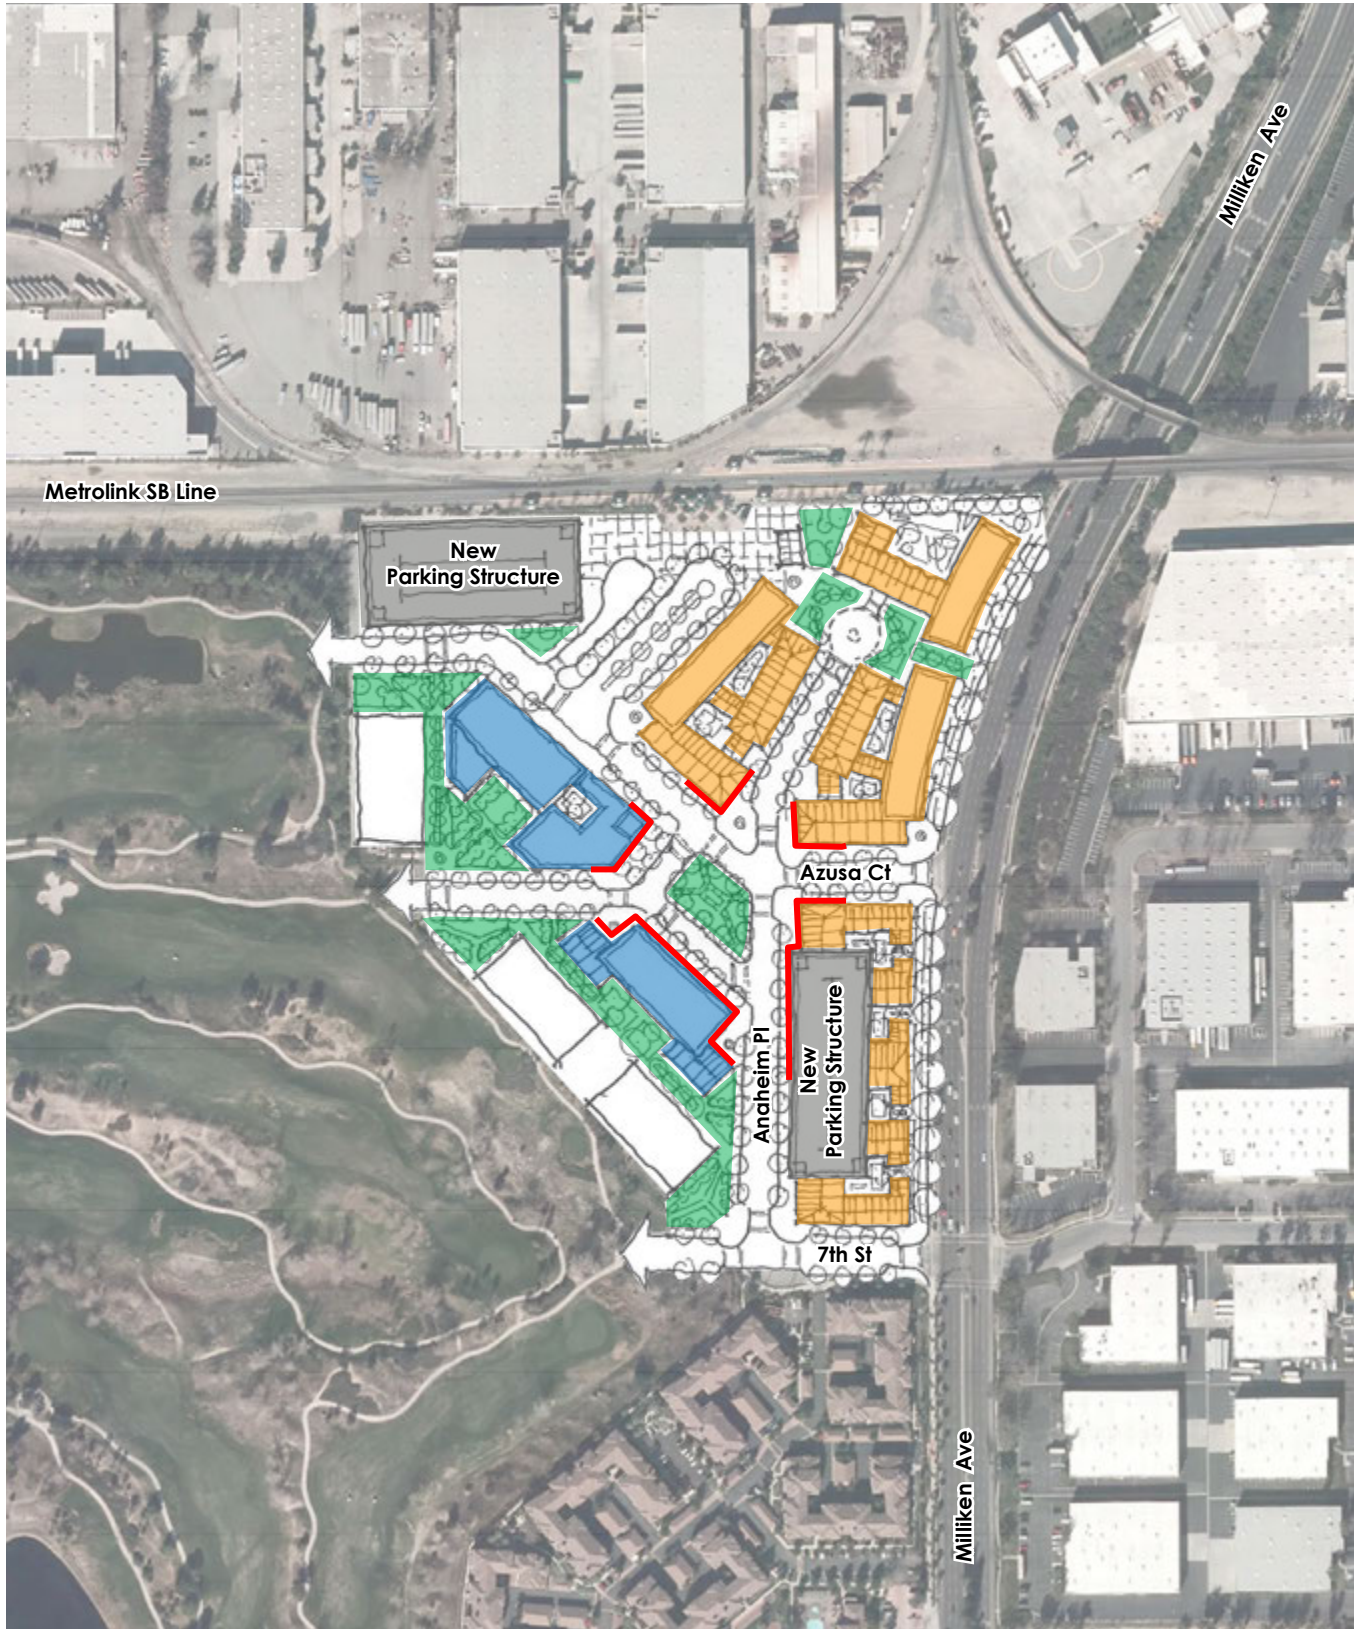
LAND USE ALTERNATIVE ILLUSTRATIVE SITE PLAN CONCEPT
